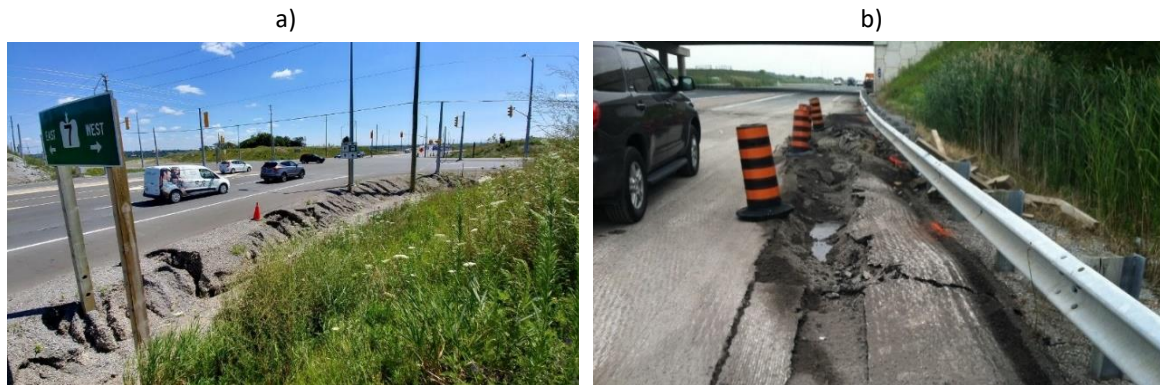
Common pavement damage due to excess water ingress. a) shoulder erosion on a highway; b) failure under load of construction equipment; ©Hein, D.
